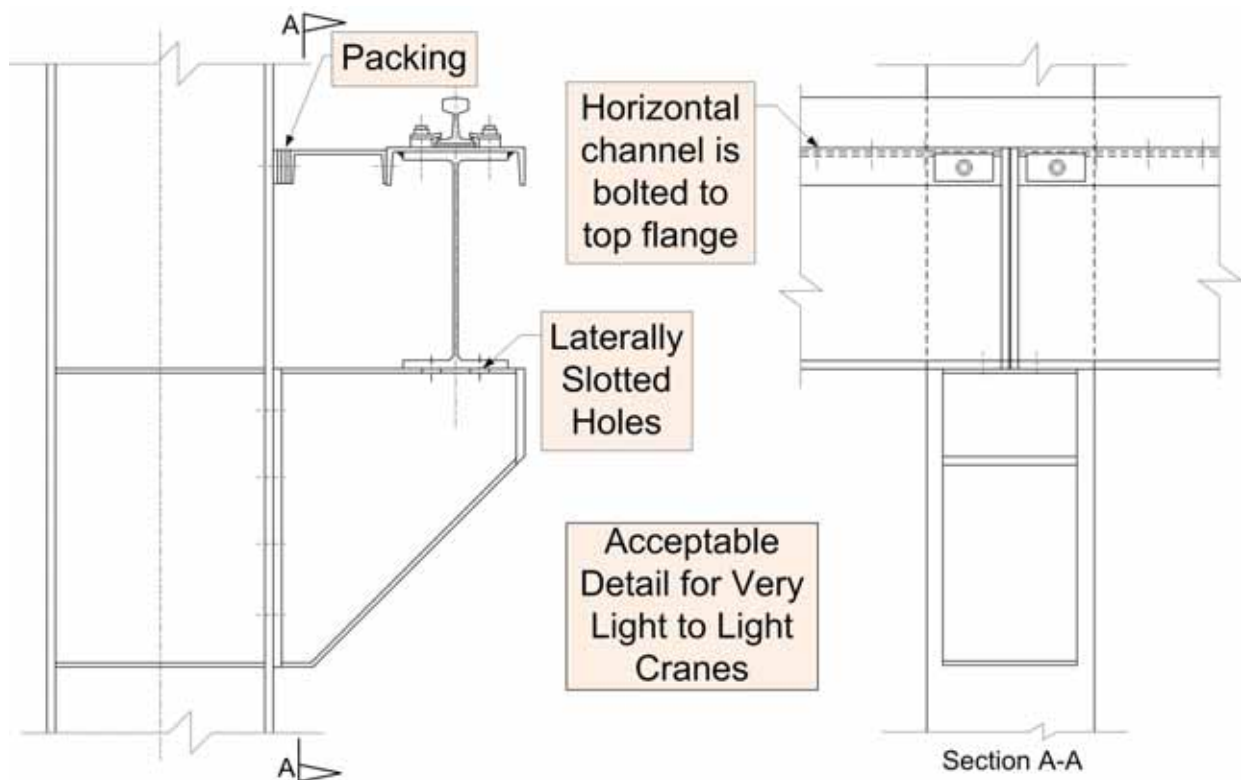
A bracket connected to the portal frame column as a light crane setup.
